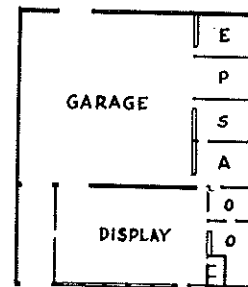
Floor plan of a garage with sales room. Ceiling height in garage and sales room is 14'-0" minimum. Smaller spaces have 9'-0" ceilings. Trusses in garage portion average 6'-0" deep.
